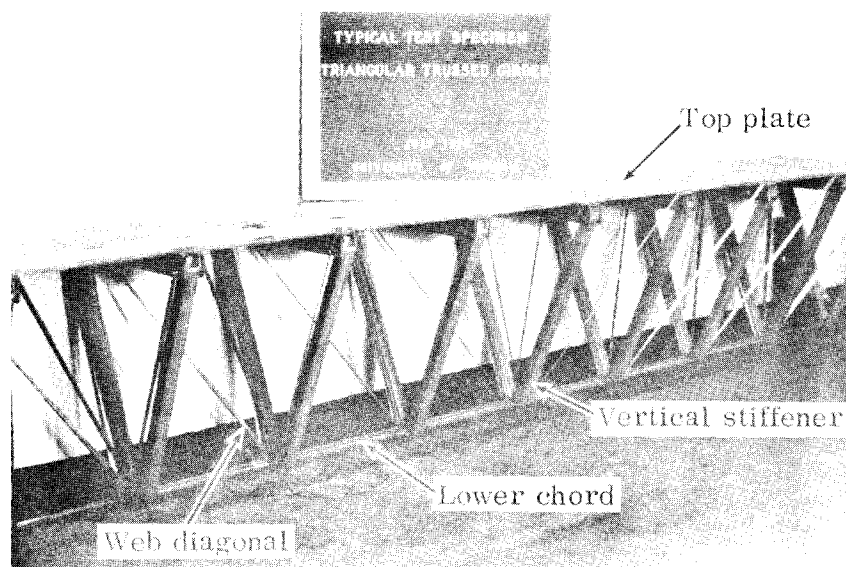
Typical test specimen of a single unit, triangular trussed girder.
